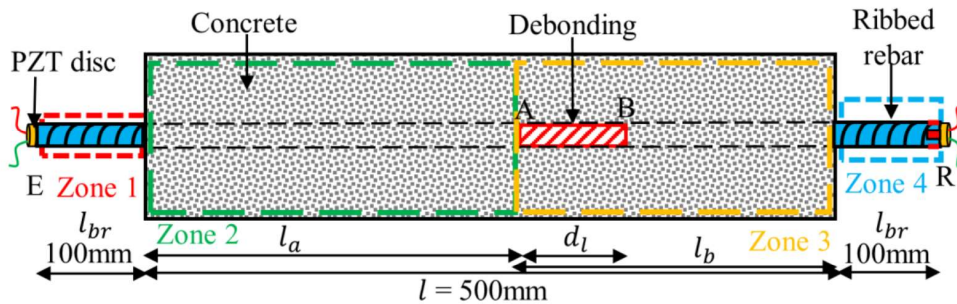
Schematics for debonded reinforced concrete specimen with excitation and receiving PZTs
